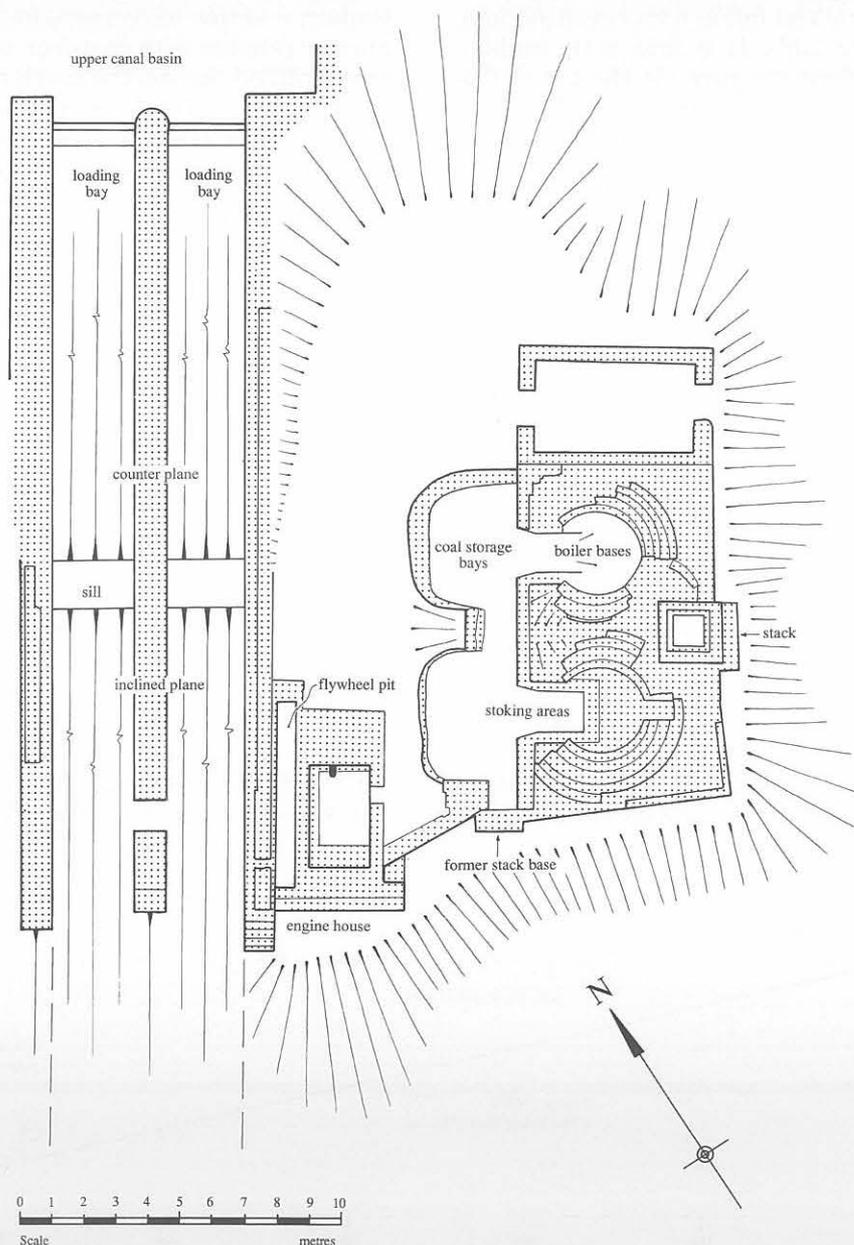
Plan of the head of the Hay Inclined Plane, showing the loading bays, engine house, boiler house, and coal storage areas.
